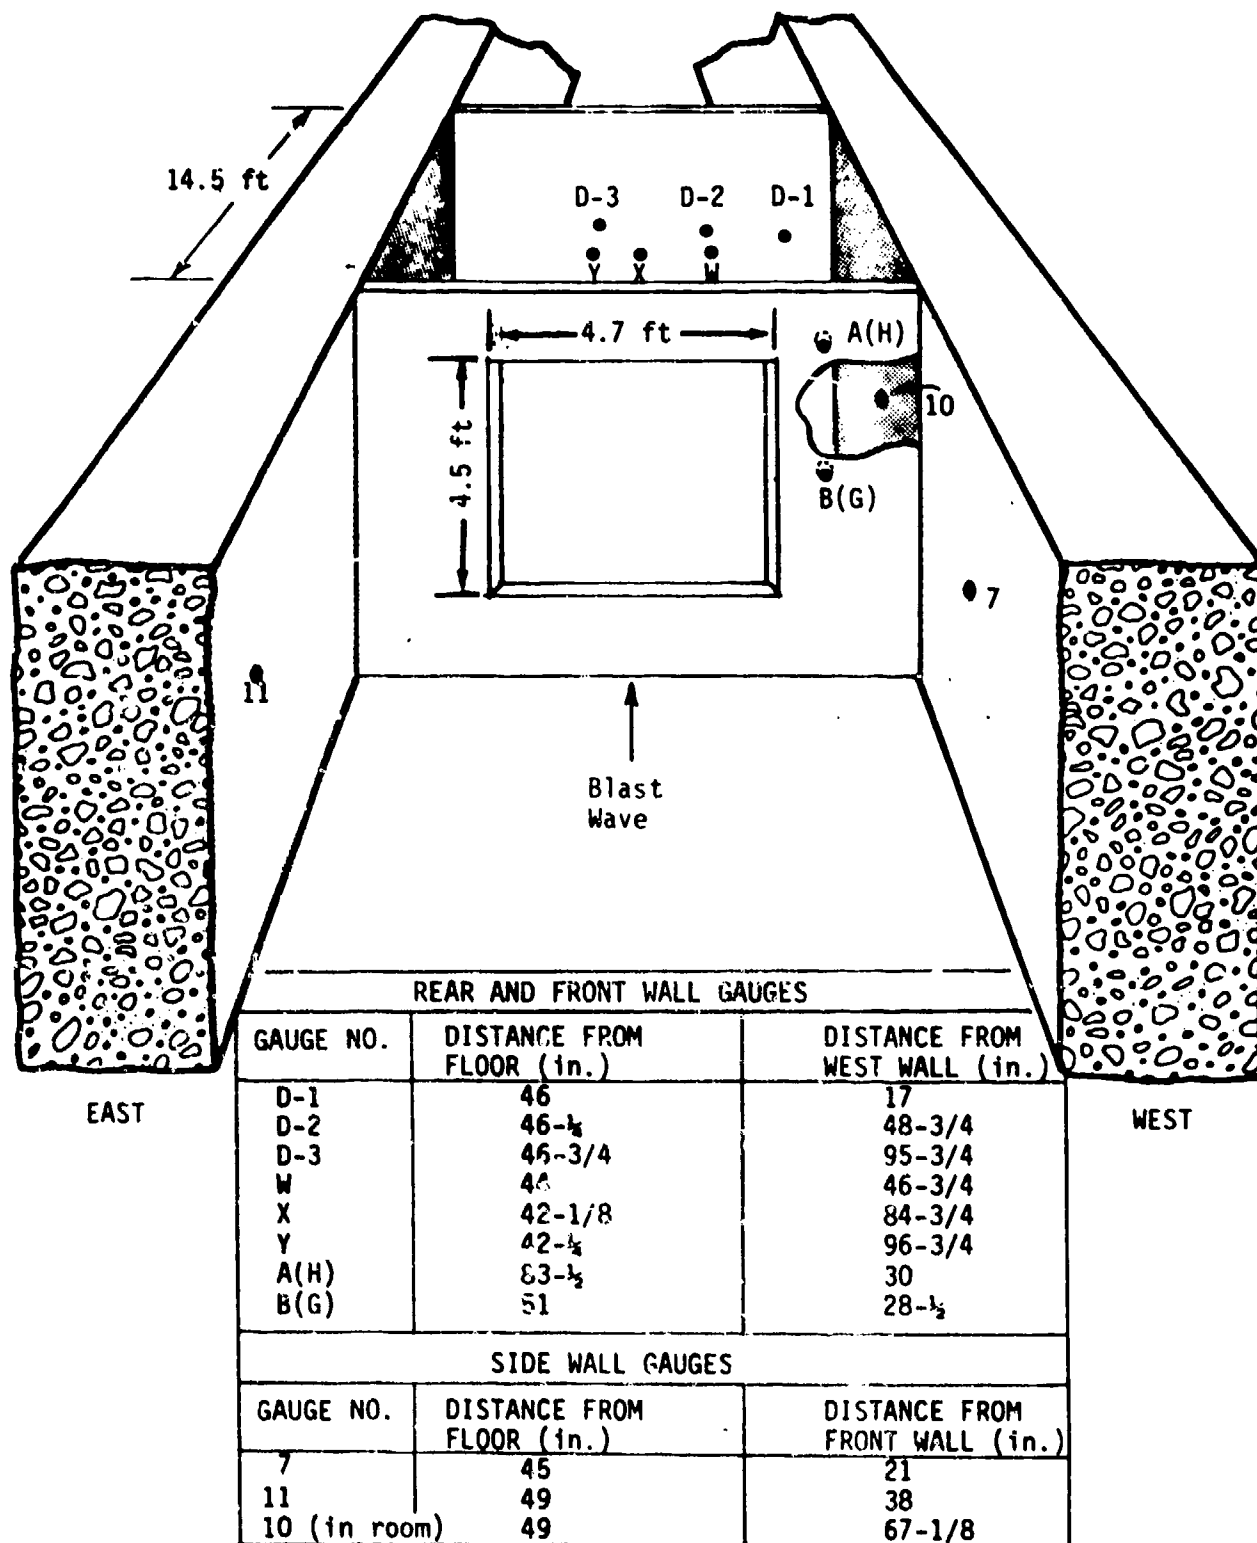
Room with a Window Test Configuration in the Shock Tunnel.
